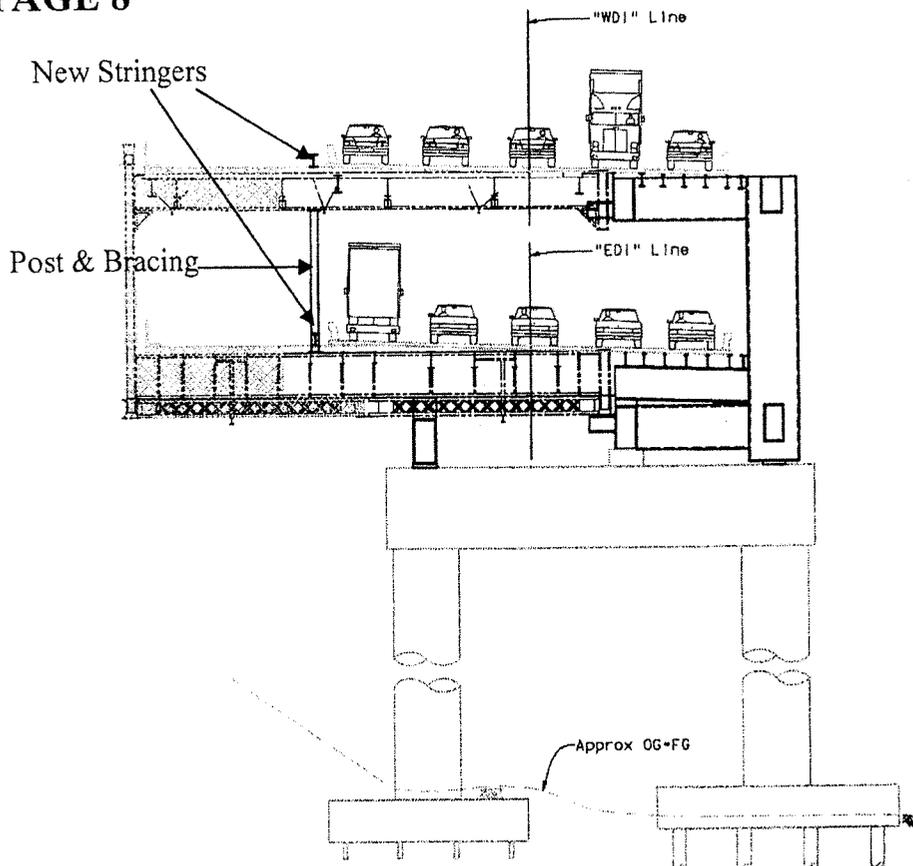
Stage 8 – Load Transfer and Demolition of the North Portion of the Span
